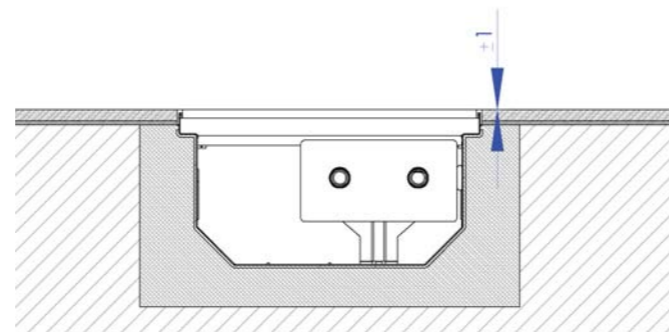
A correctly installed convector has a decorative frame aligned with the final floor with a tolerance of ± 1mm.
